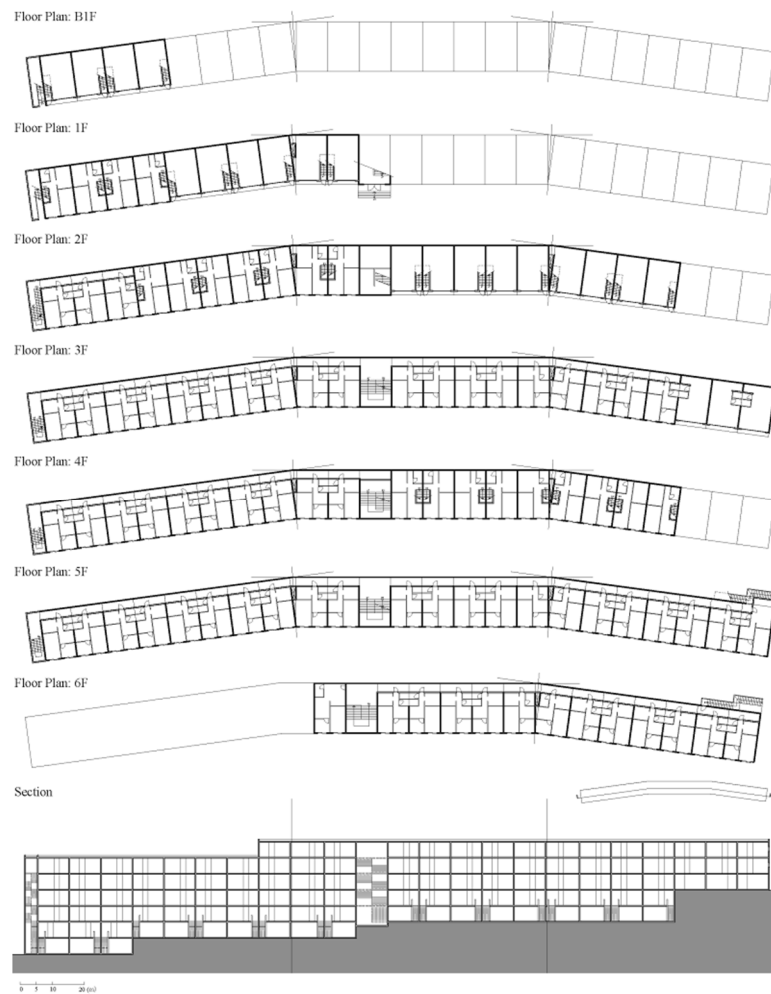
Plans and sections of St. Joseph Apartment (redrawn by: author).
